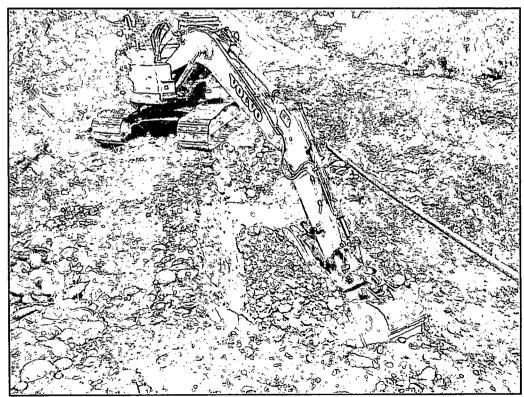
Excavation along the southwest portion of the pipeline remediation excavation, facing north.
